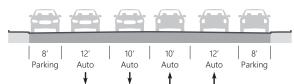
EXISTING CROSS-SECTION MILES AVENUE
